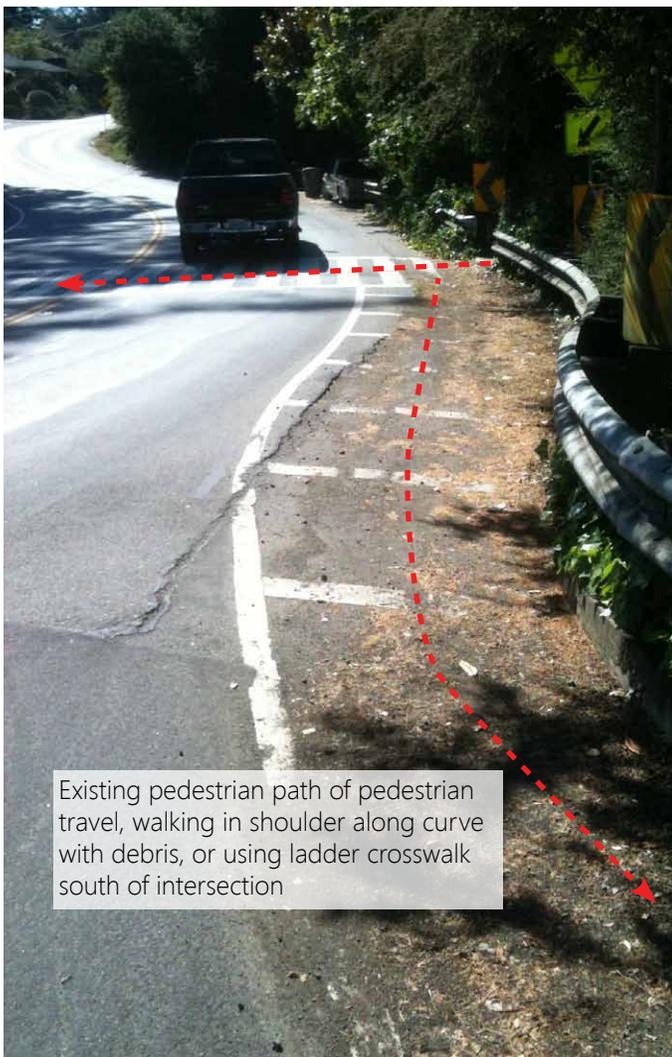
Brewster Drive/Arlington Boulevard Site Photos
